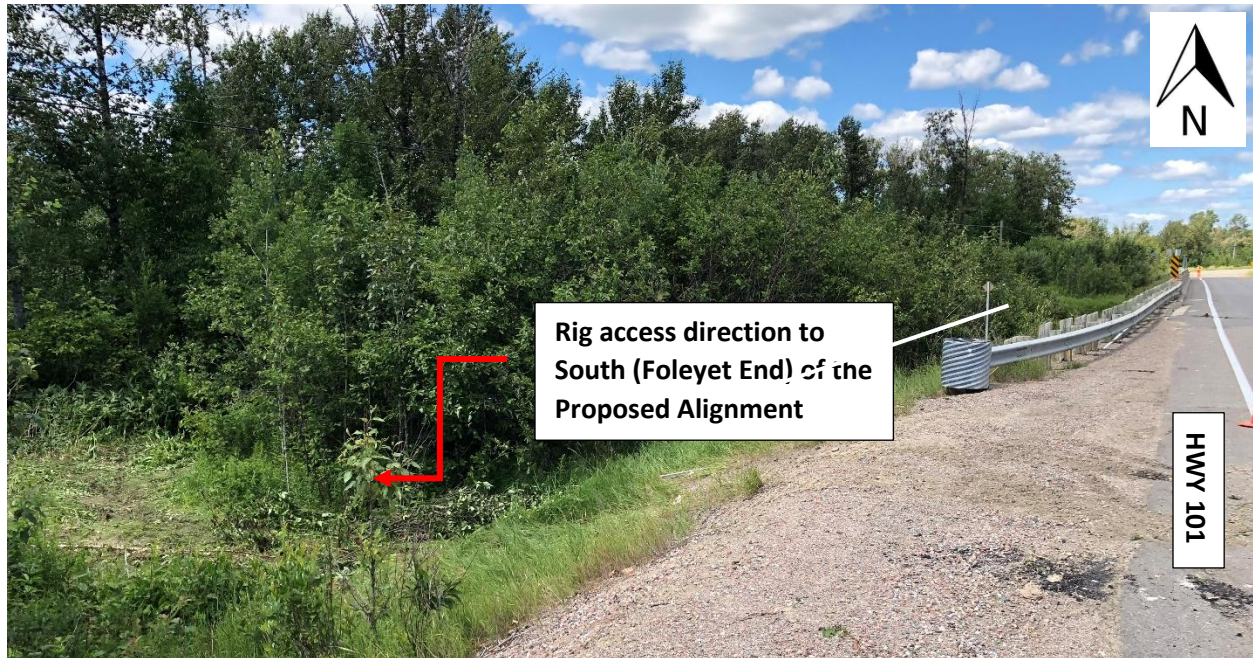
Looking Northwest – Rig Access to BH17-3, 17-4 & BH18-1 (June 2018)
